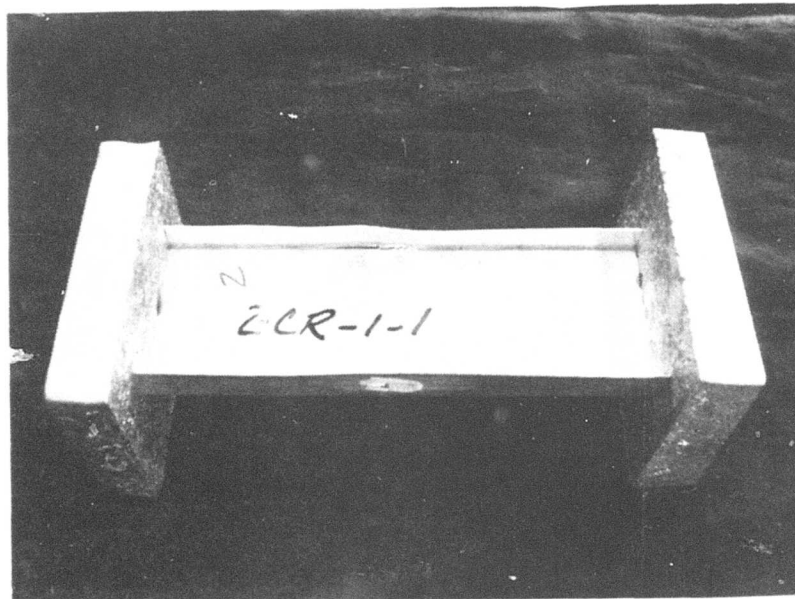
TYPICAL CRIPPLING SPECIMEN FAILURE
